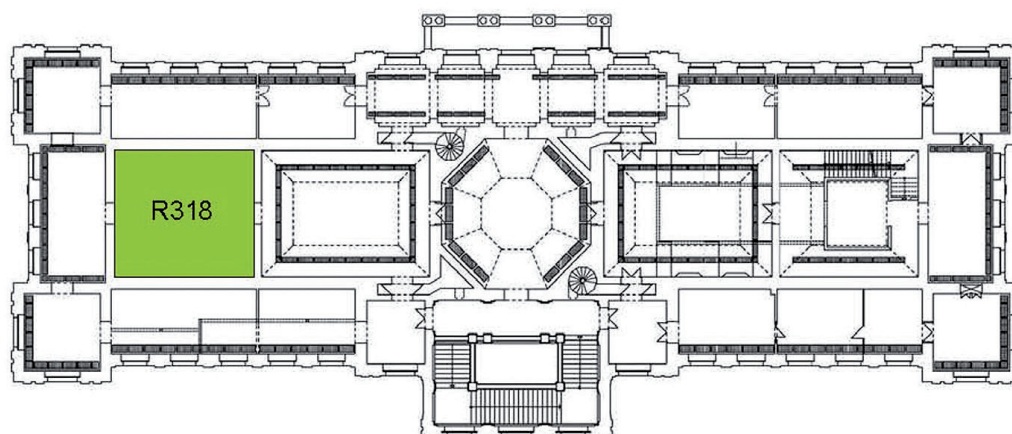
Floor plan of 2<sup>nd</sup> floor – Ducal Museum Gotha.
